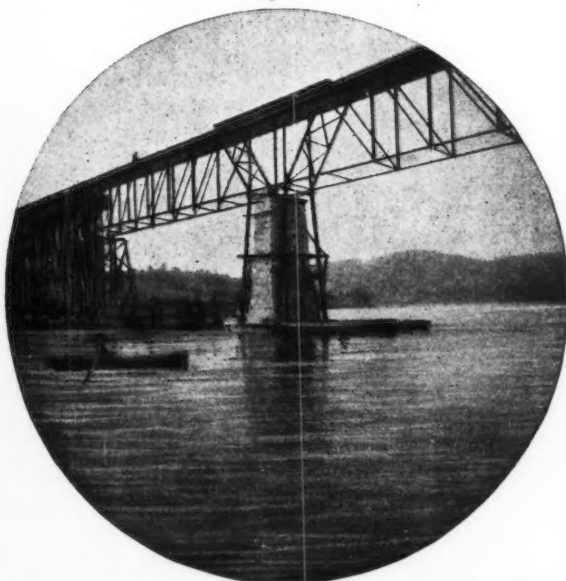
is a view of the old spans still on iron towers, but both masonry piers are built.
